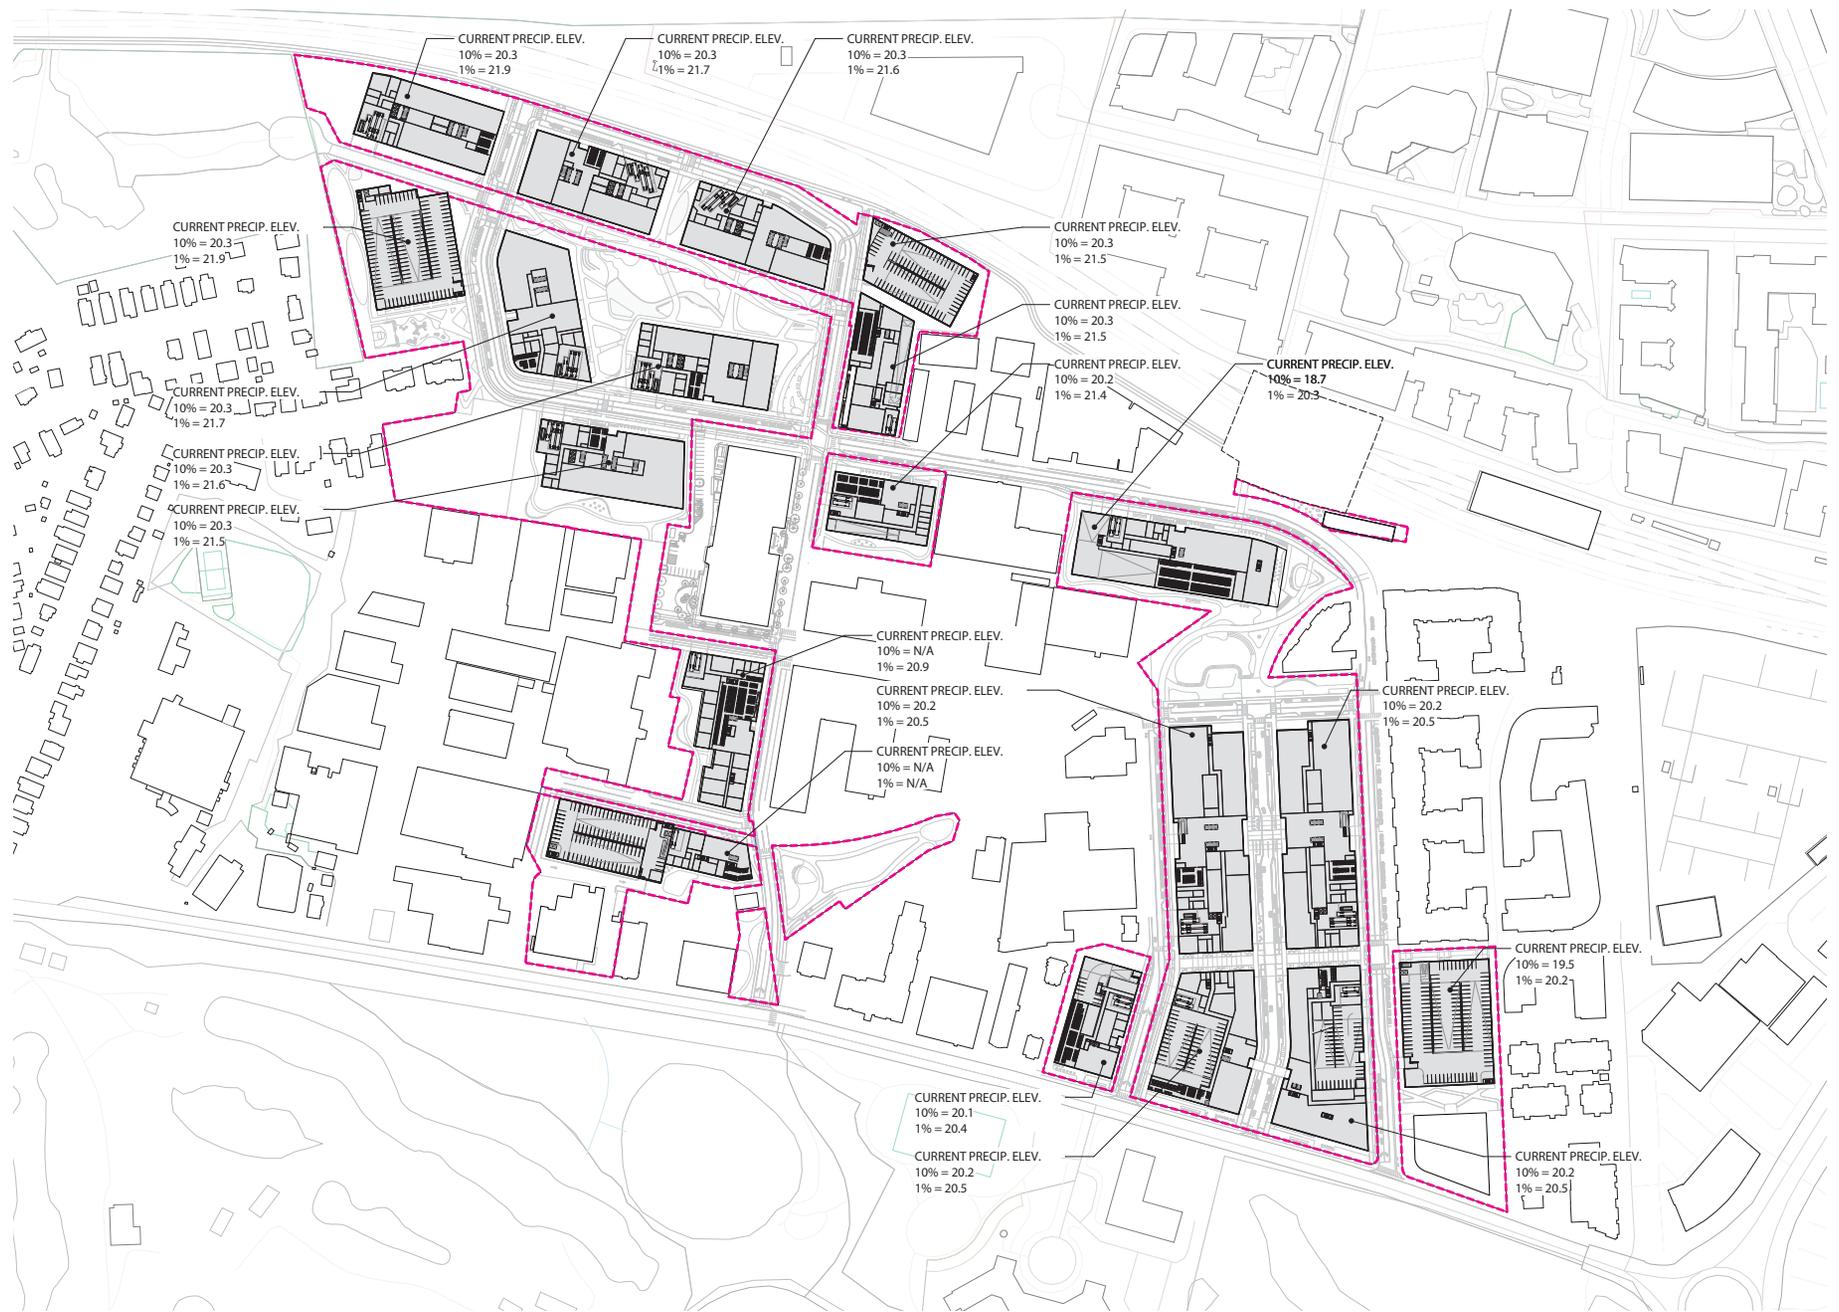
FloodViewer 2025 Precipitation Elevations
